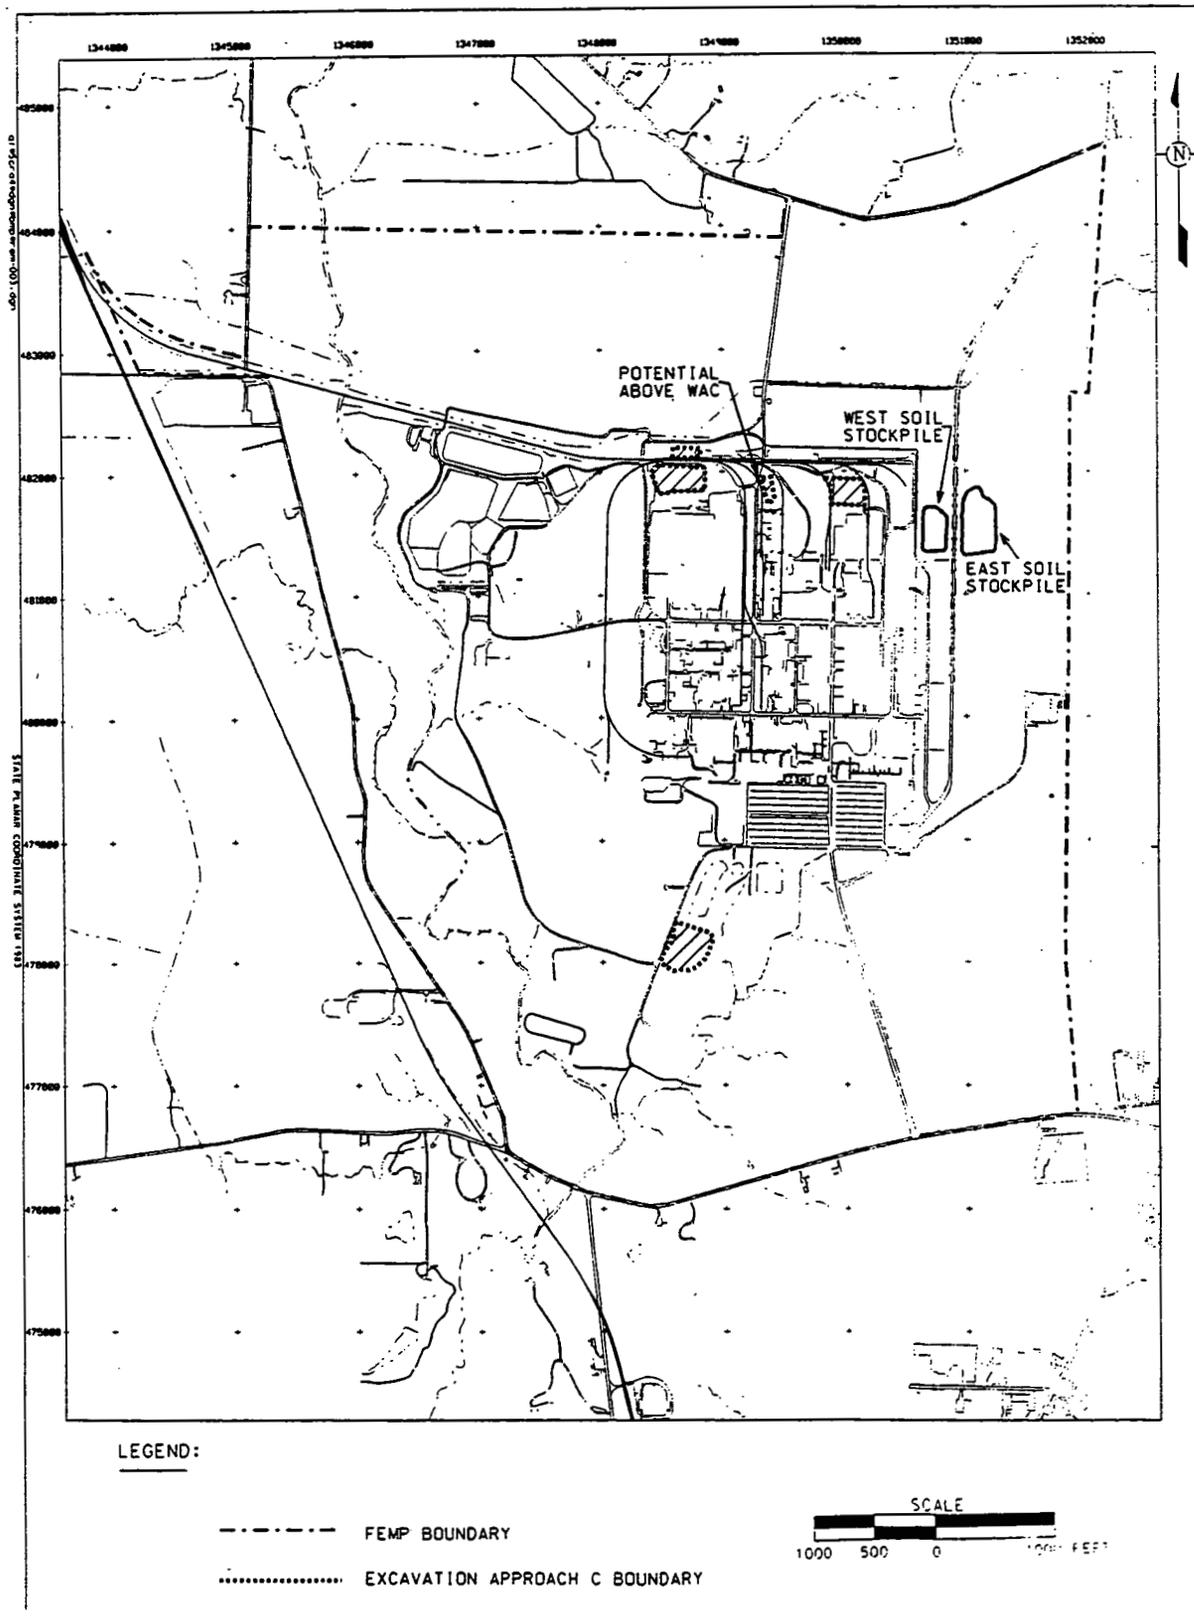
Estimated Excavation Areas for Excavation Approach C
